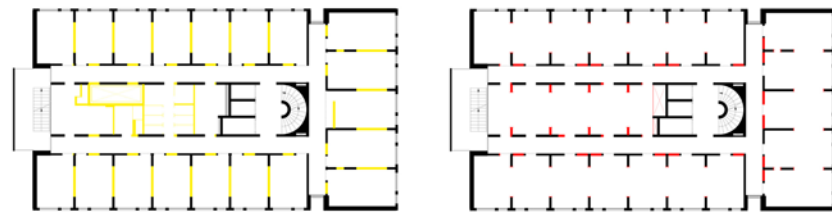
Typical floor plan with yellow highlights marking the demolished building elements.
